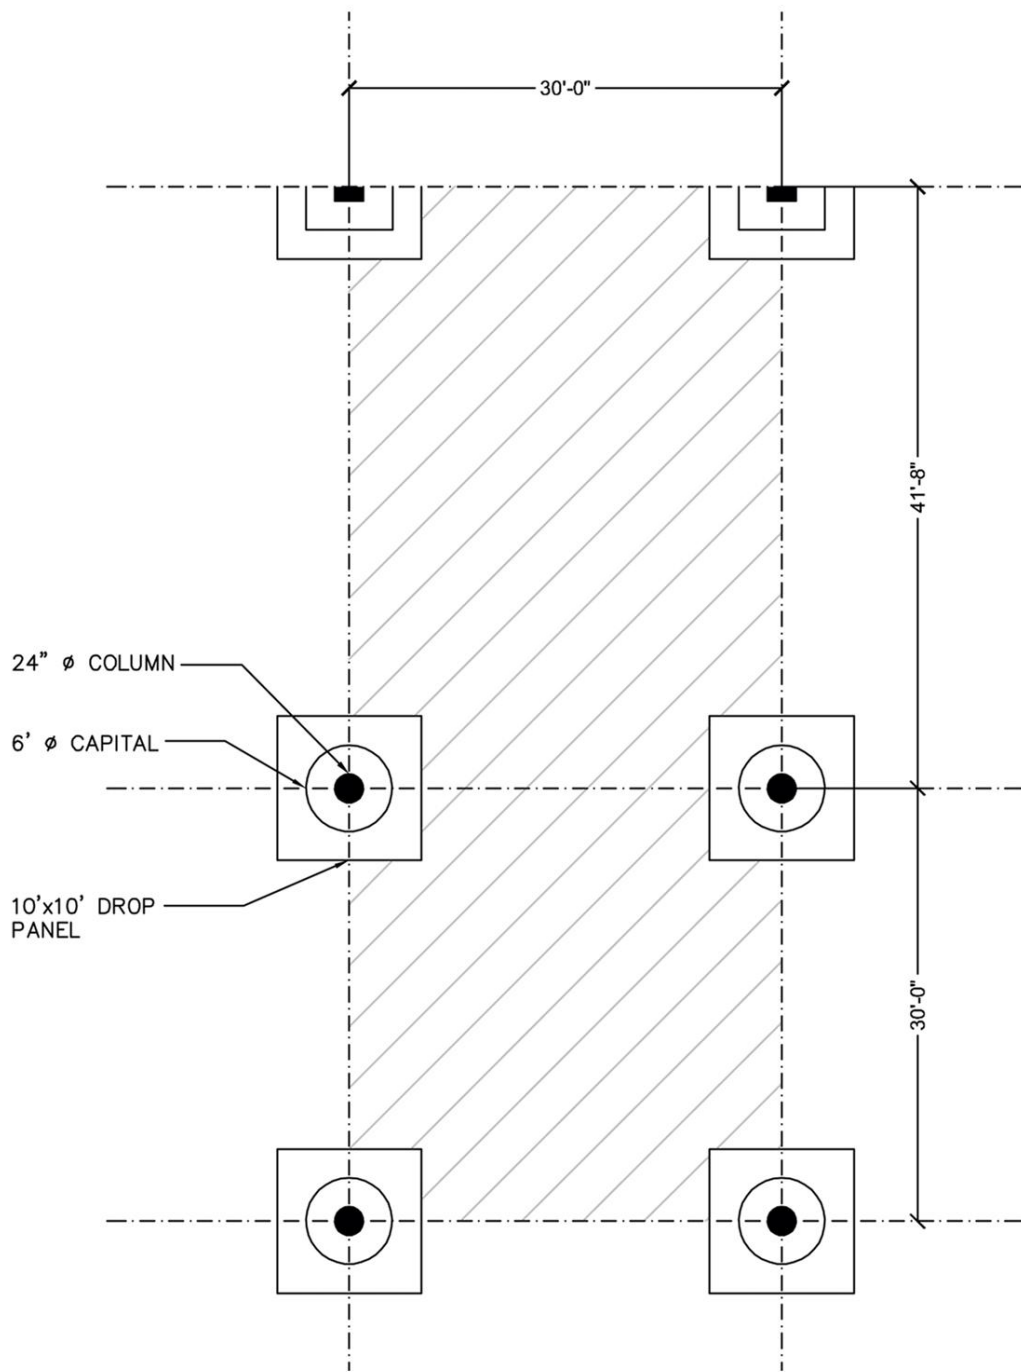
TYPICAL FLAT SLAB LAYOUT
